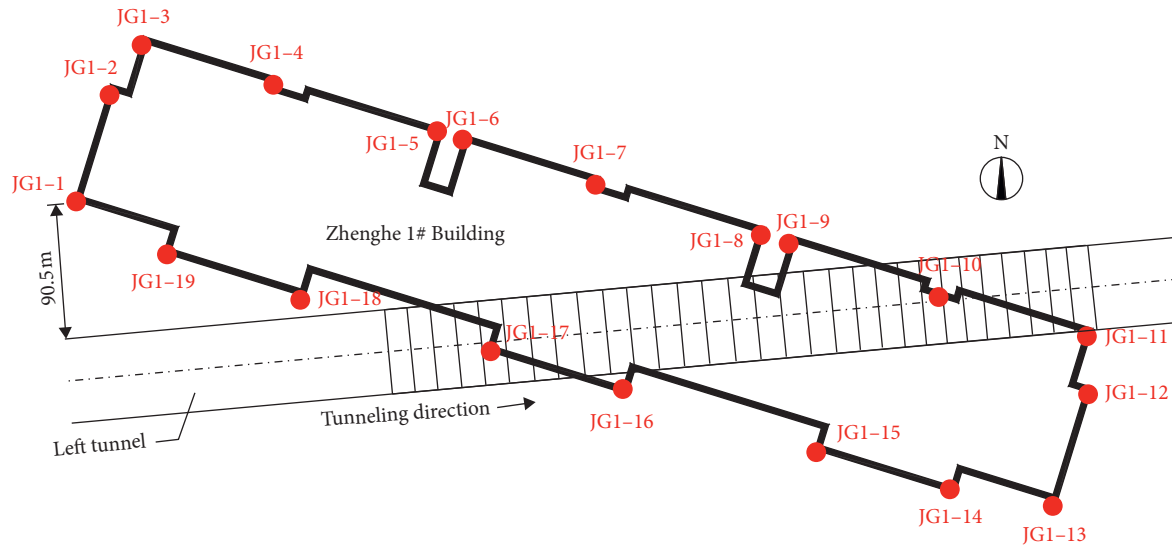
Layout drawing of the monitoring points in Zhenghe 1# building.
